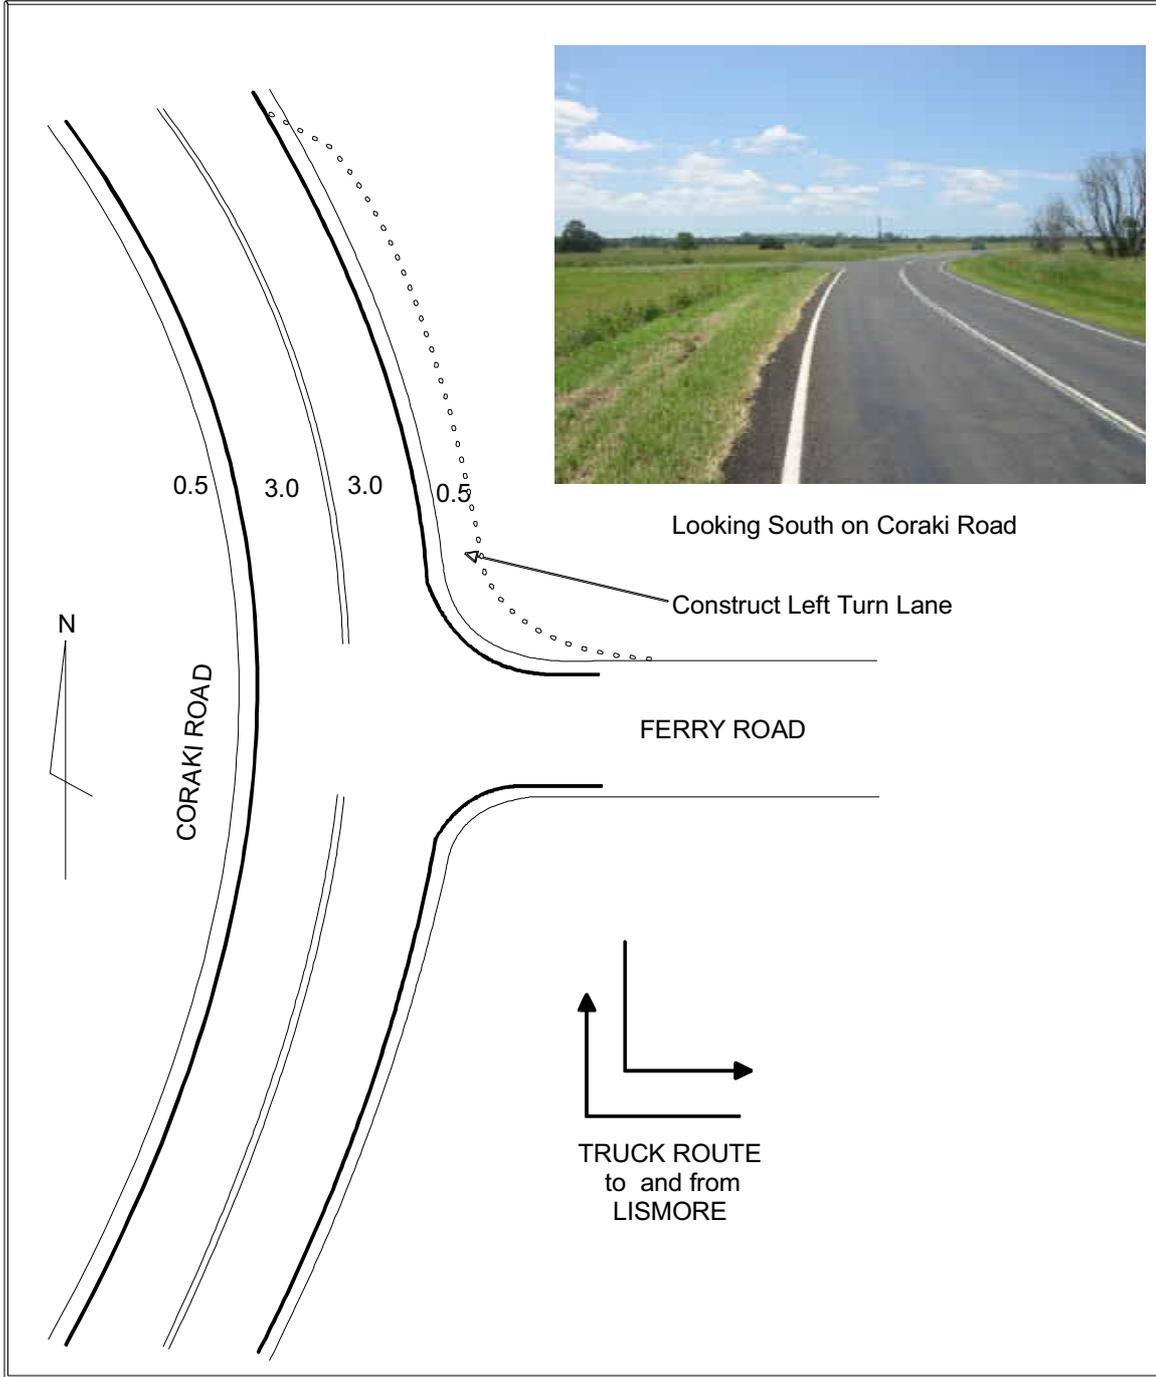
Proposed widening of Coraki Road and Wyrallah Ferry Road
